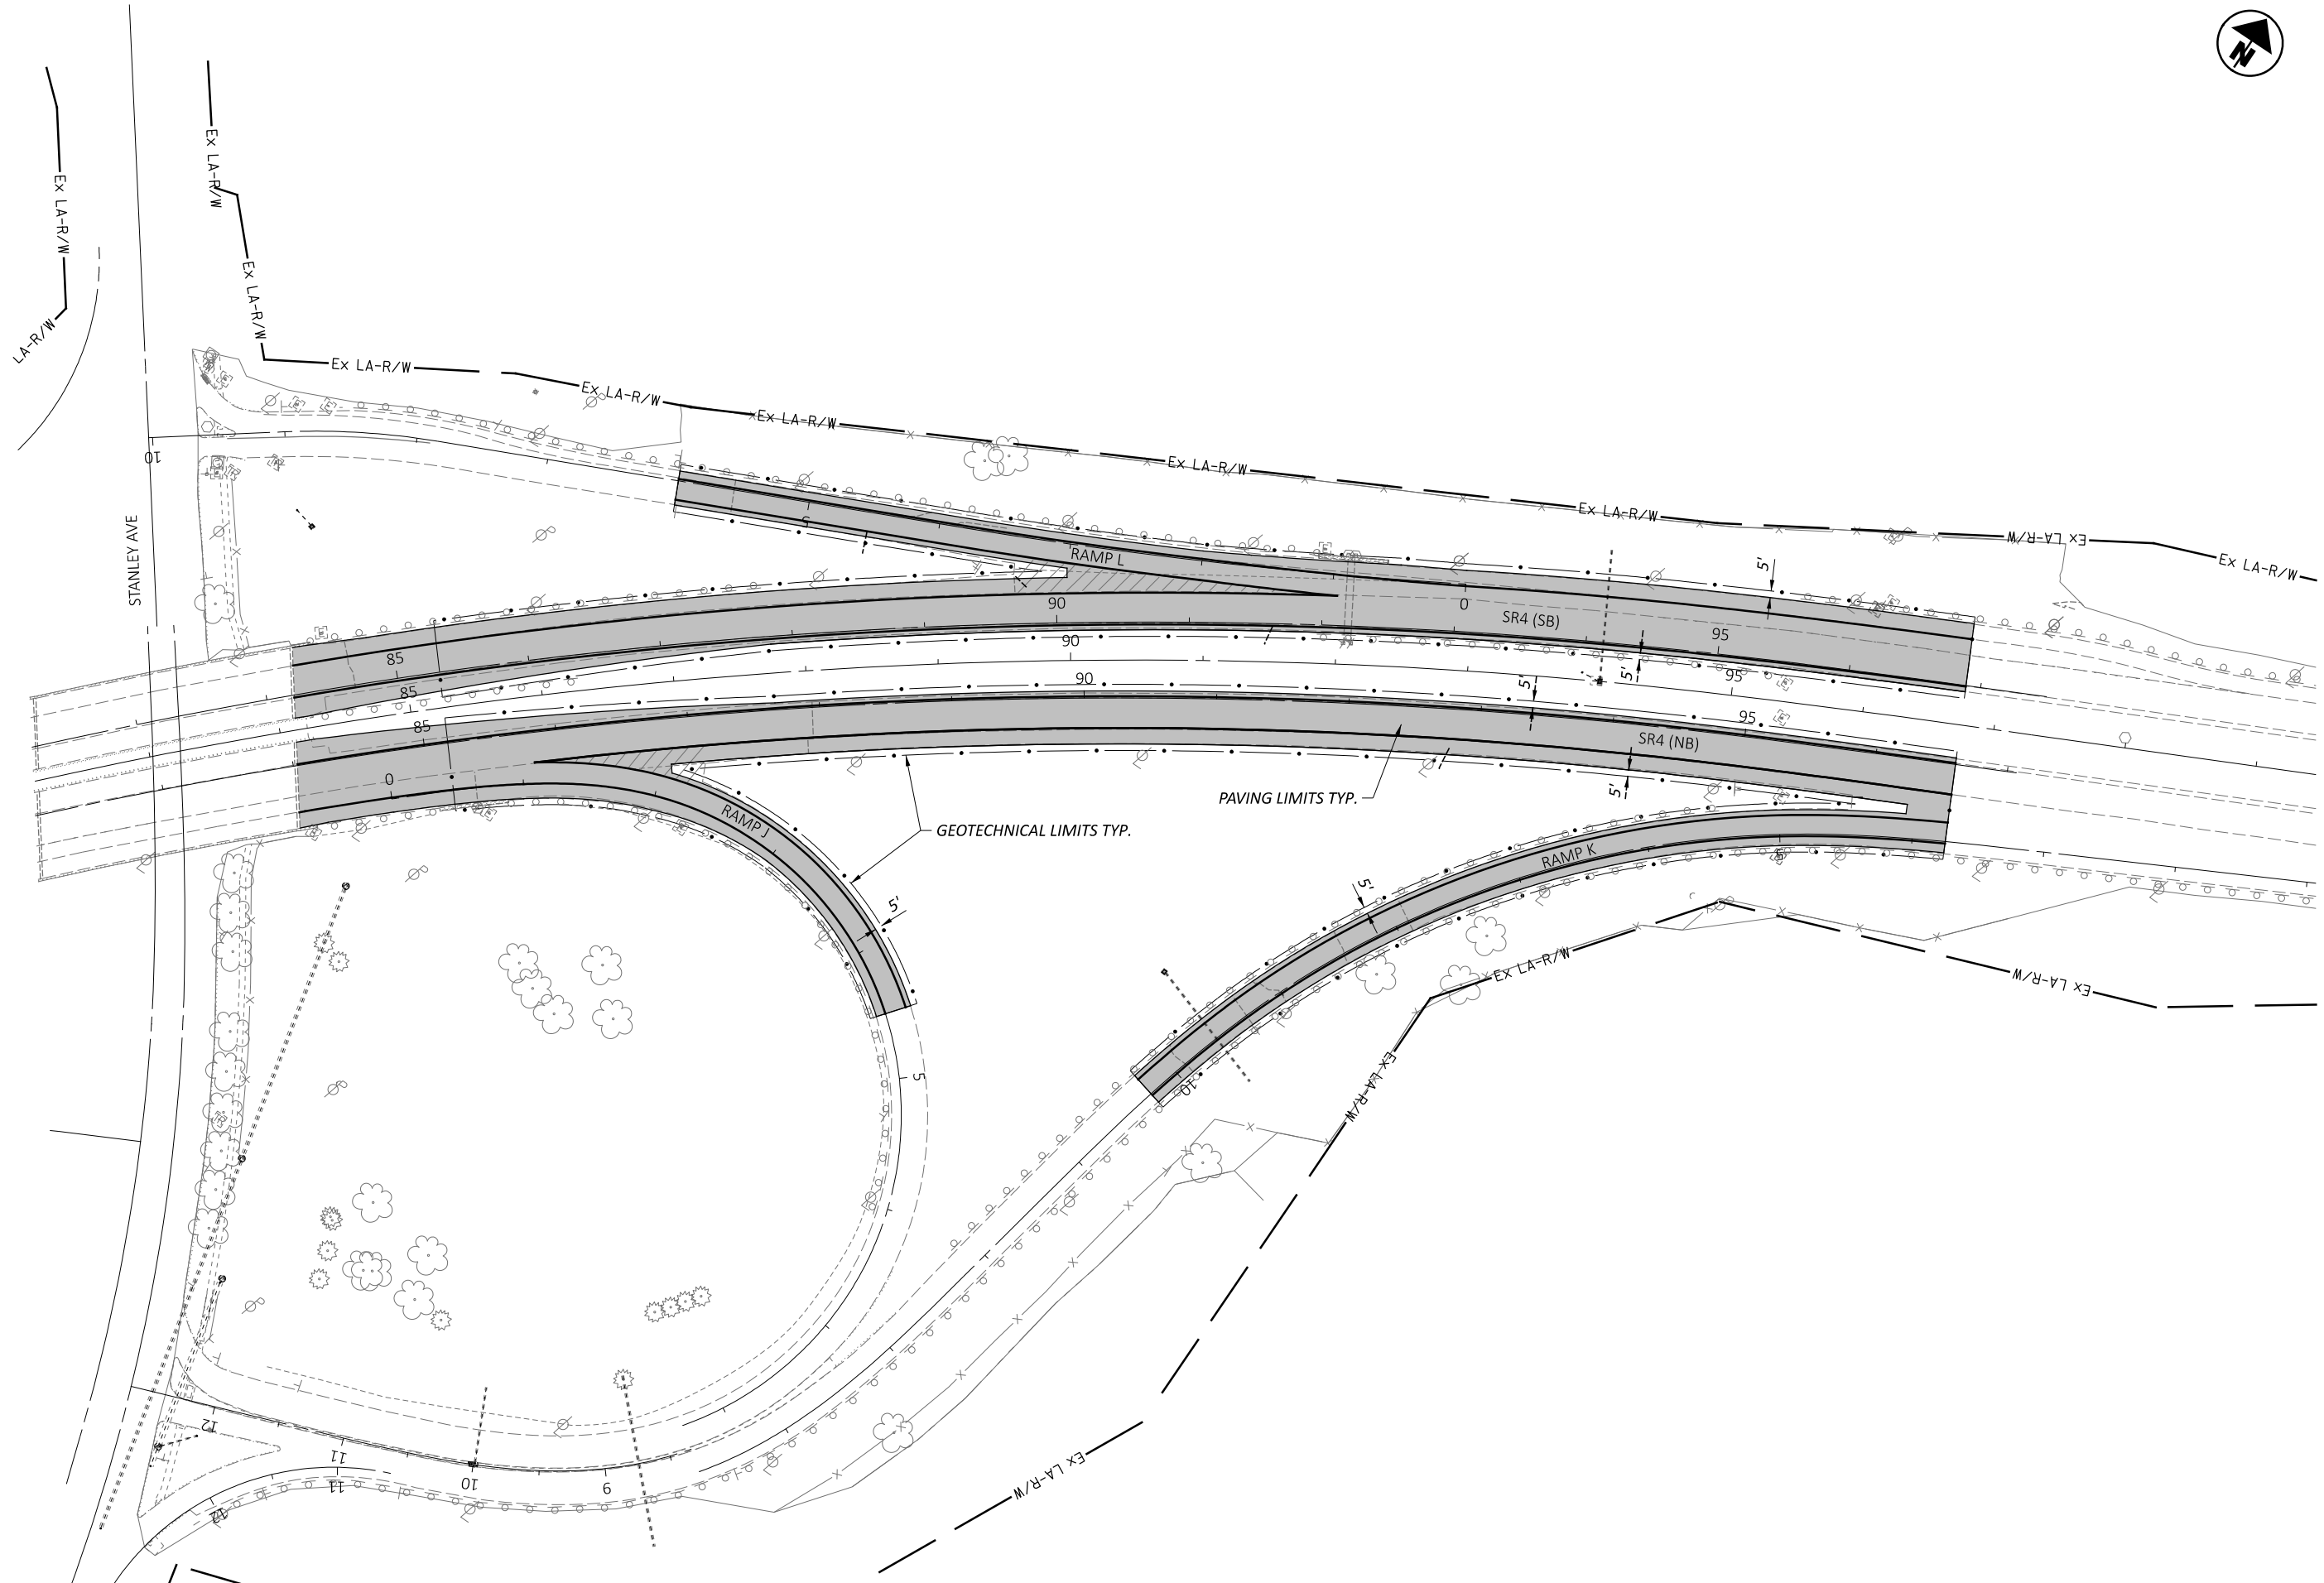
PAVING AND GEOTECHNICAL LIMITS PLAN
